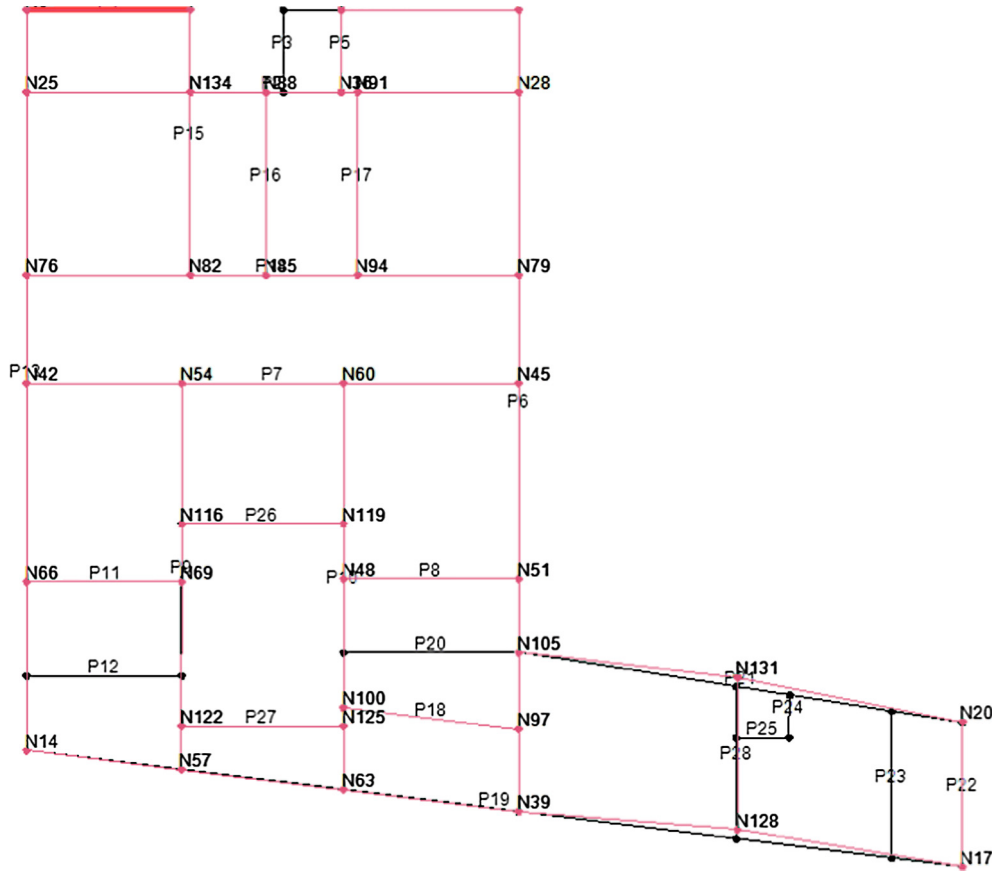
The building 1st level deformed shape related to the 1st vibration mode.
